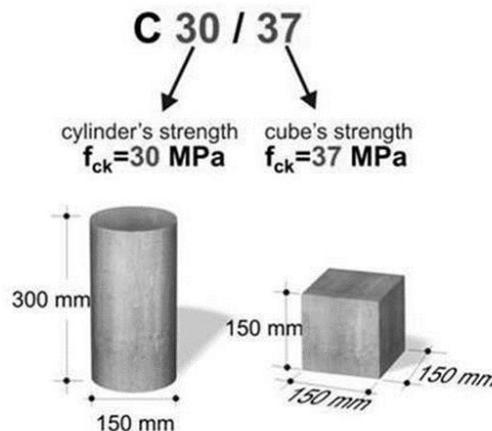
Concrete Cylinder and Cube Test Samples [75]
